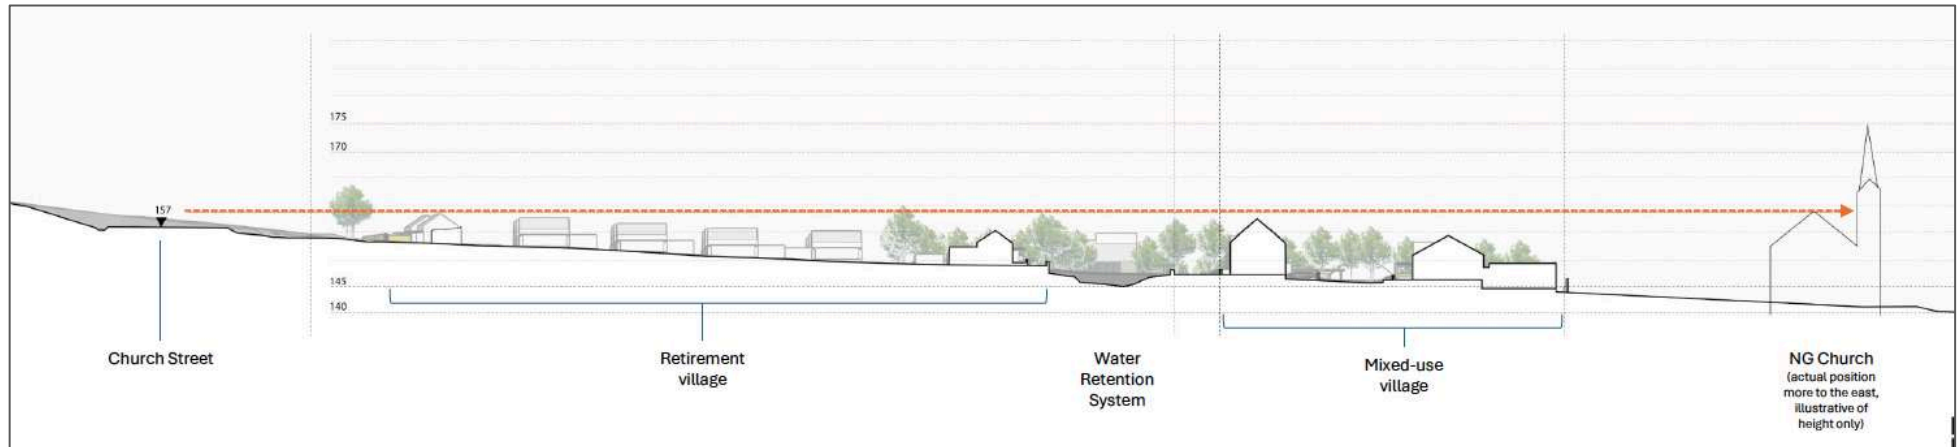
Site Section CC from Church Street [R311] over the proposed development towards the Church on Main Road, Britz 2026
